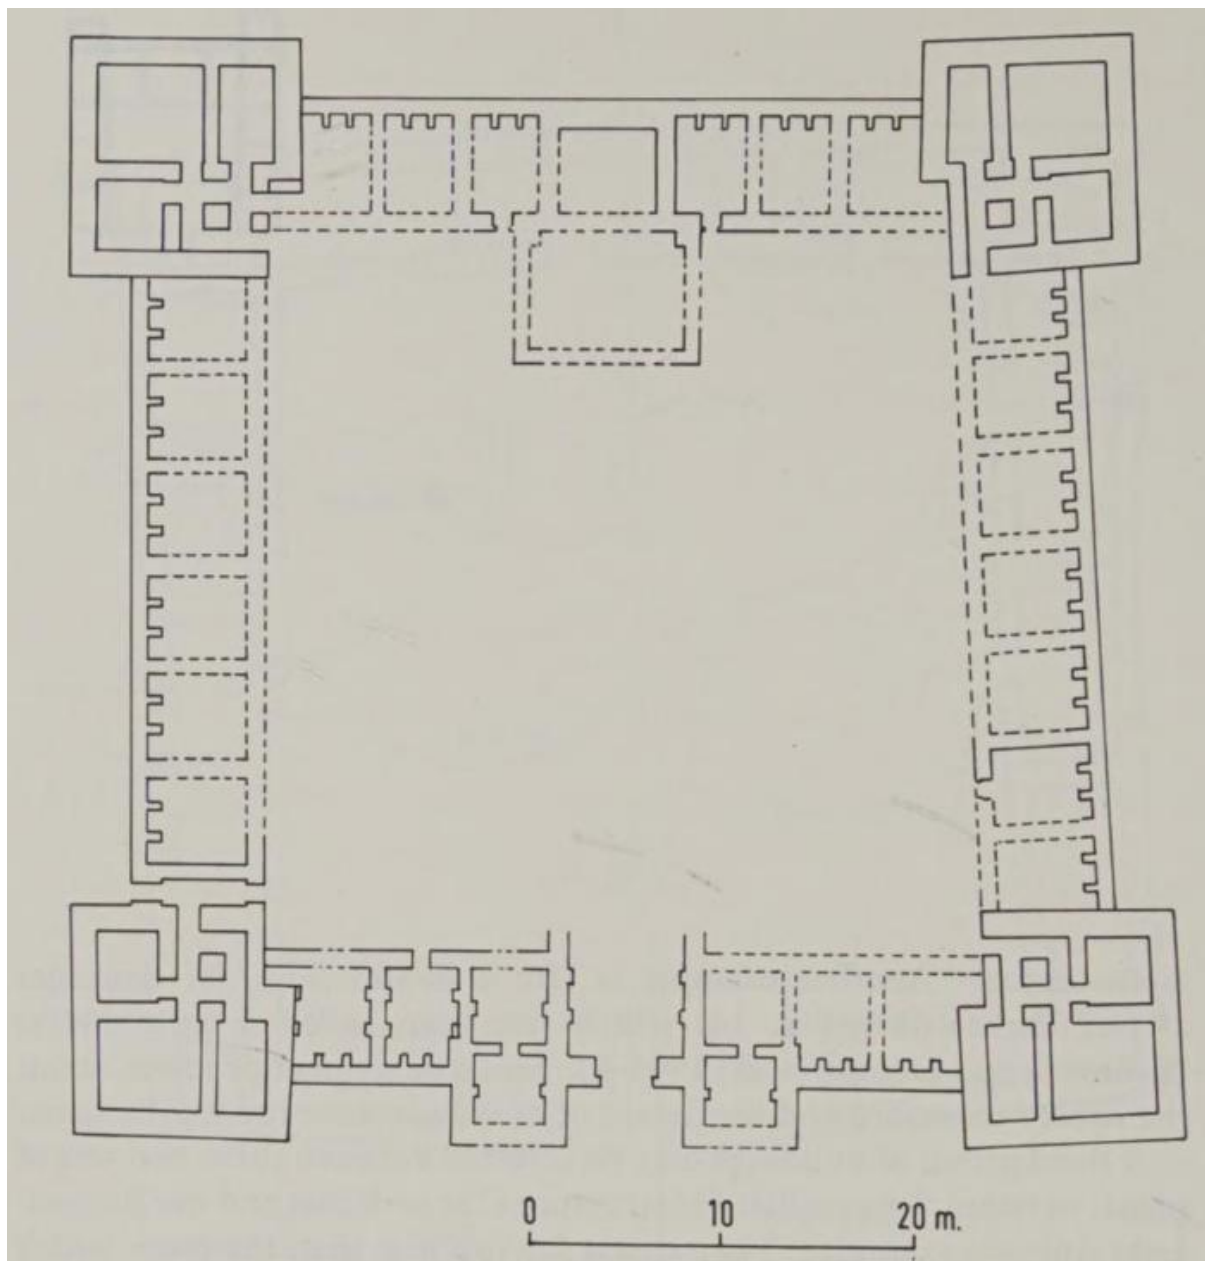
Khan consisting of rooms around a centered courtyard, plan (Helms, 1990).
